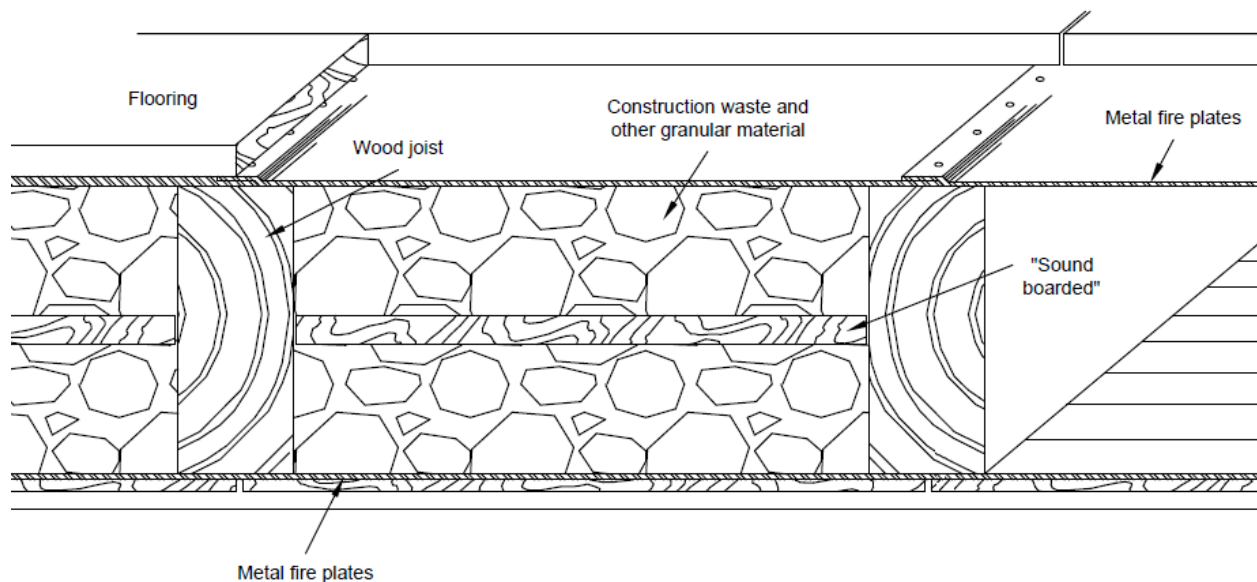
An alternative configuration of installing metal plates on wooden joists (as adapted from [45]).
